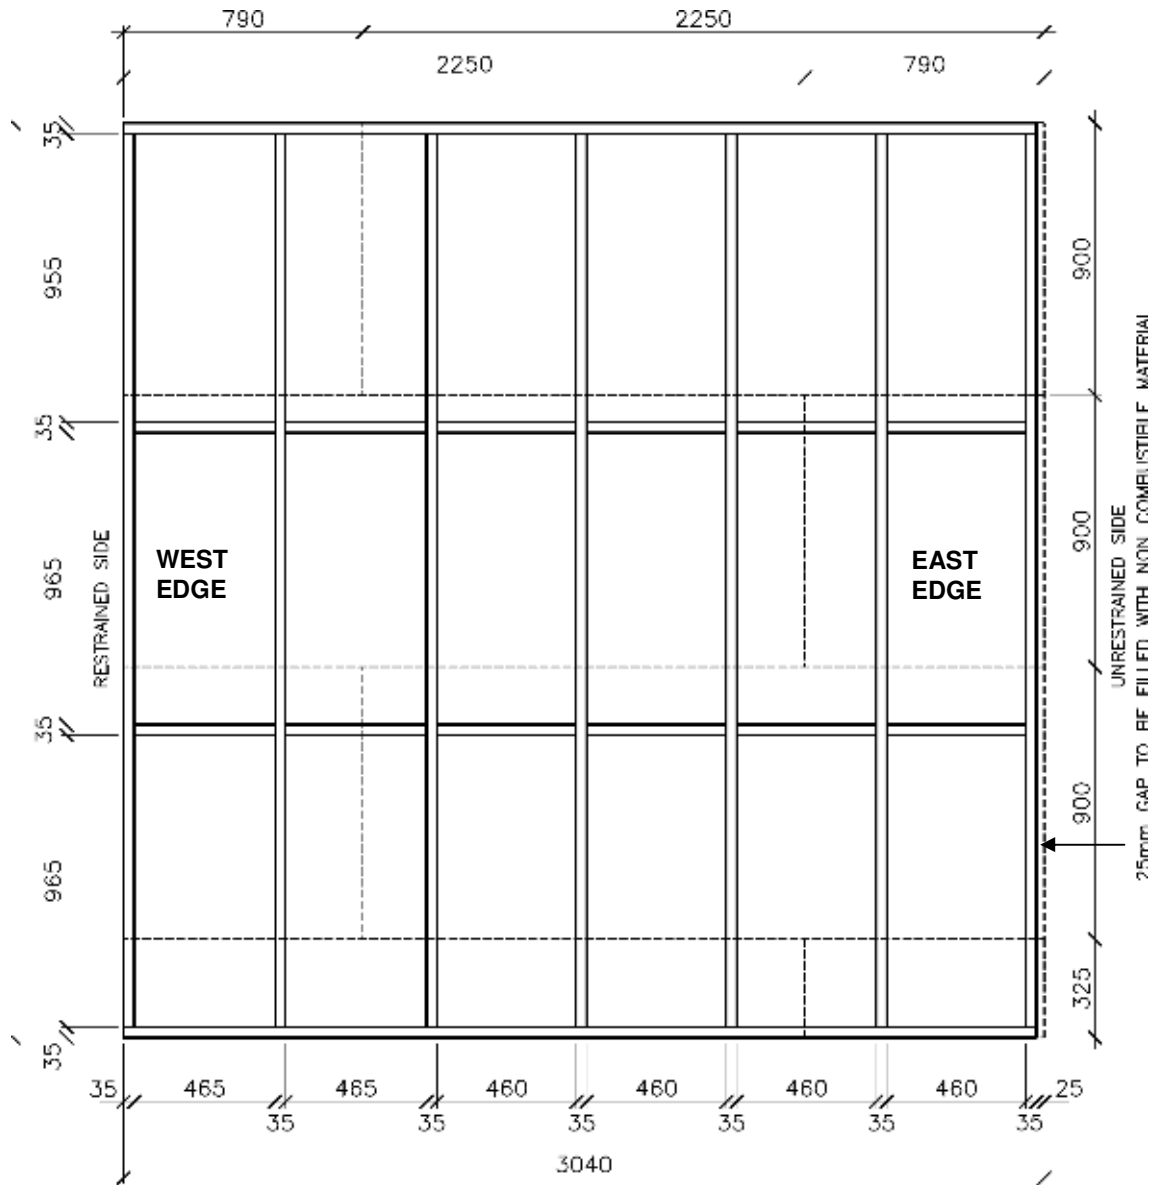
Test Specimen – (Drawing provided by test sponsor)
